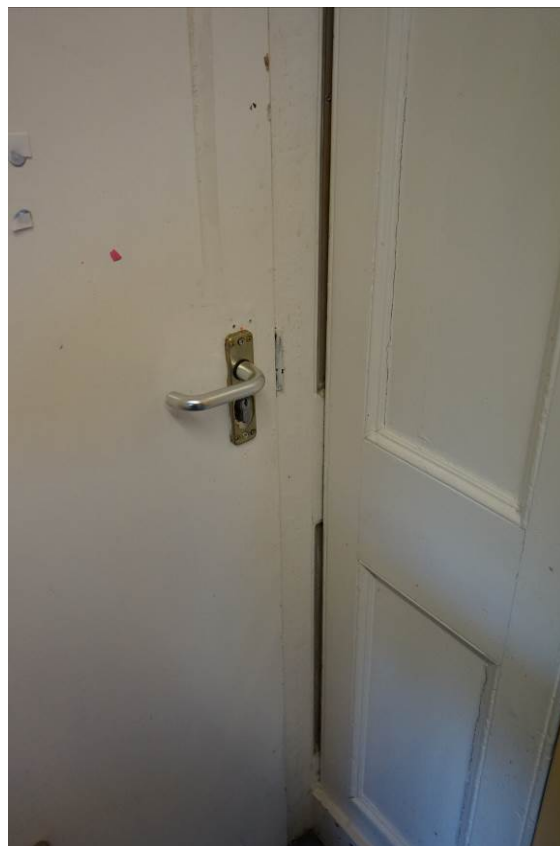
room F.01 door to F.02 detail of moulded panelling round door heading behind western partition
